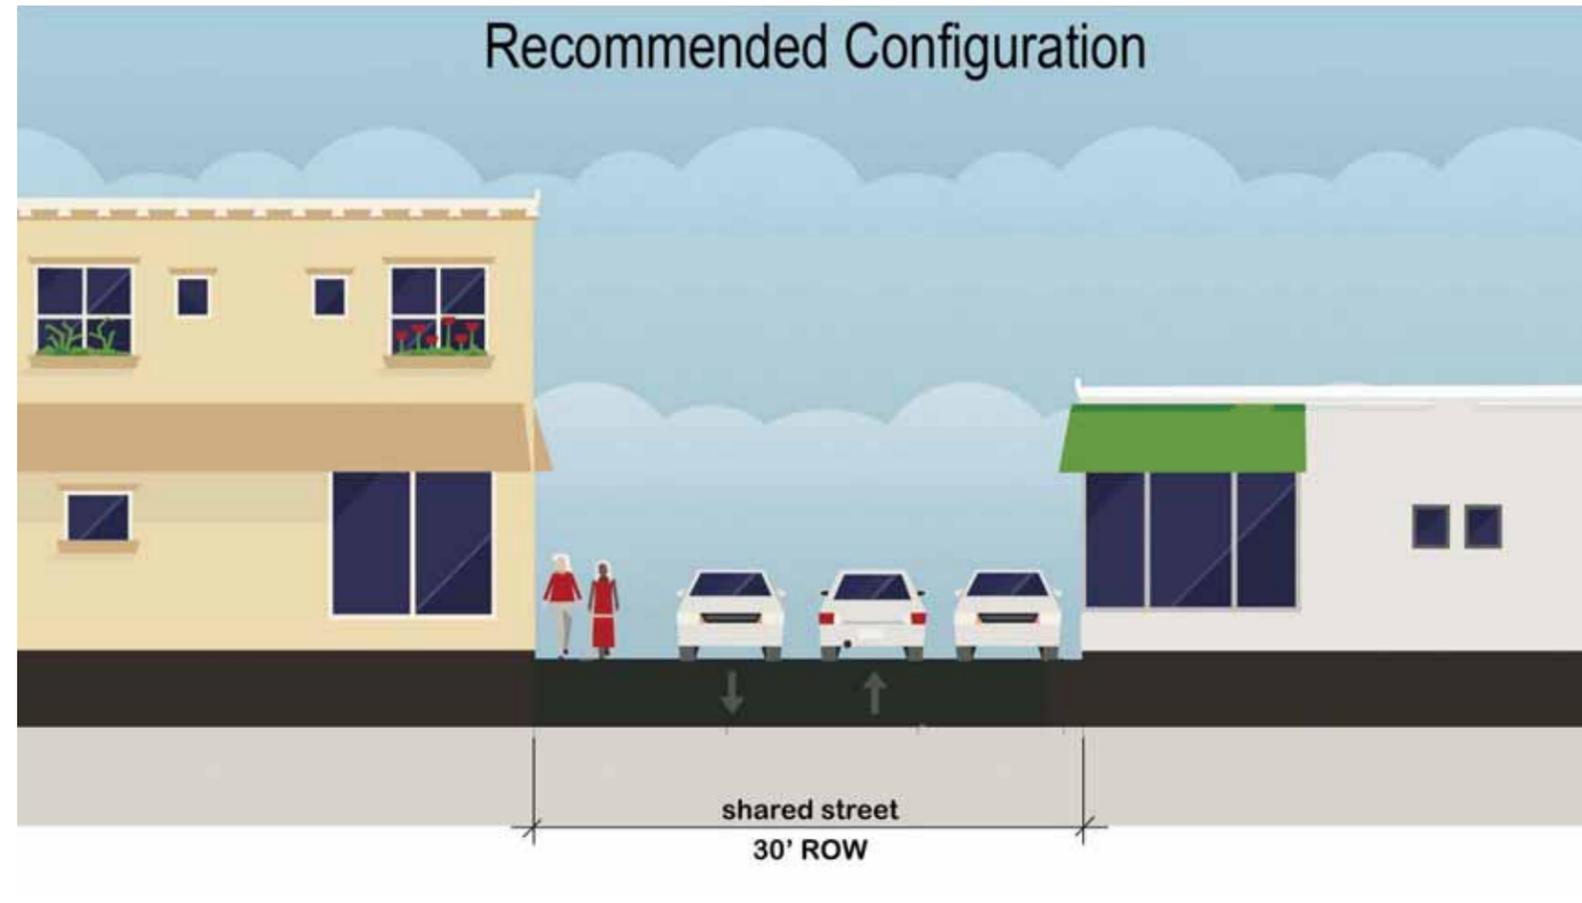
Lancaster Street (Hanover Street to Preble Street)
